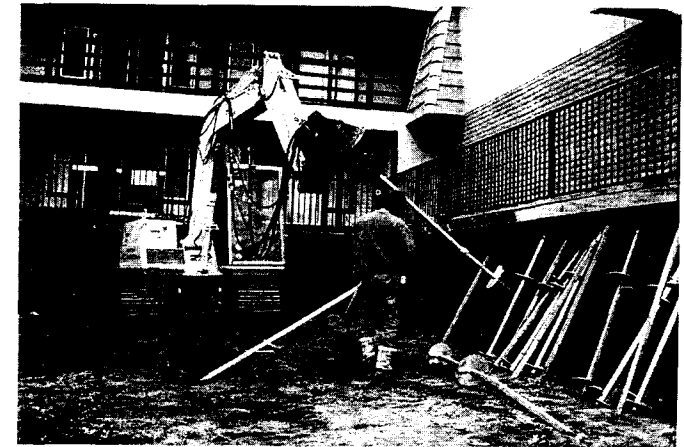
Installation of a helical anchor to be used as a tieback for a sheet pile wall. Once these anchors are installed, the soil in the foreground will be excavated (Photo courtesy of A. B. Chance Company).
